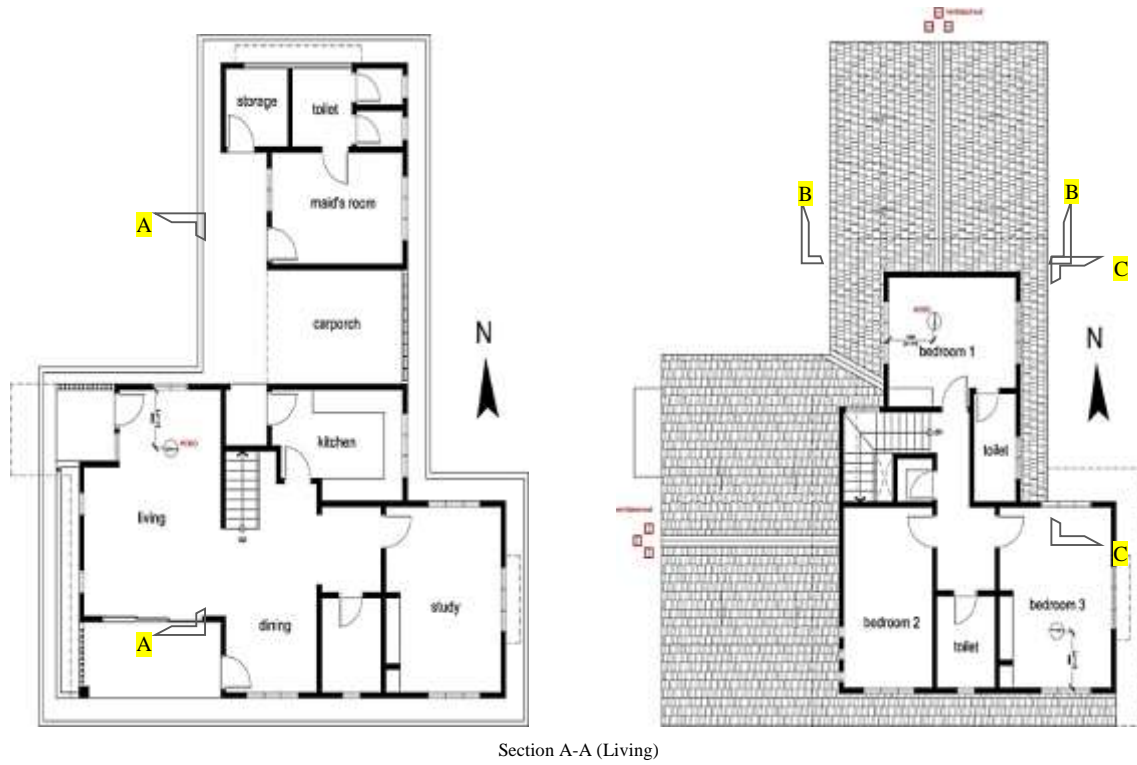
Case study house ground floor (left) and first floor (right). (Source: Authors)
